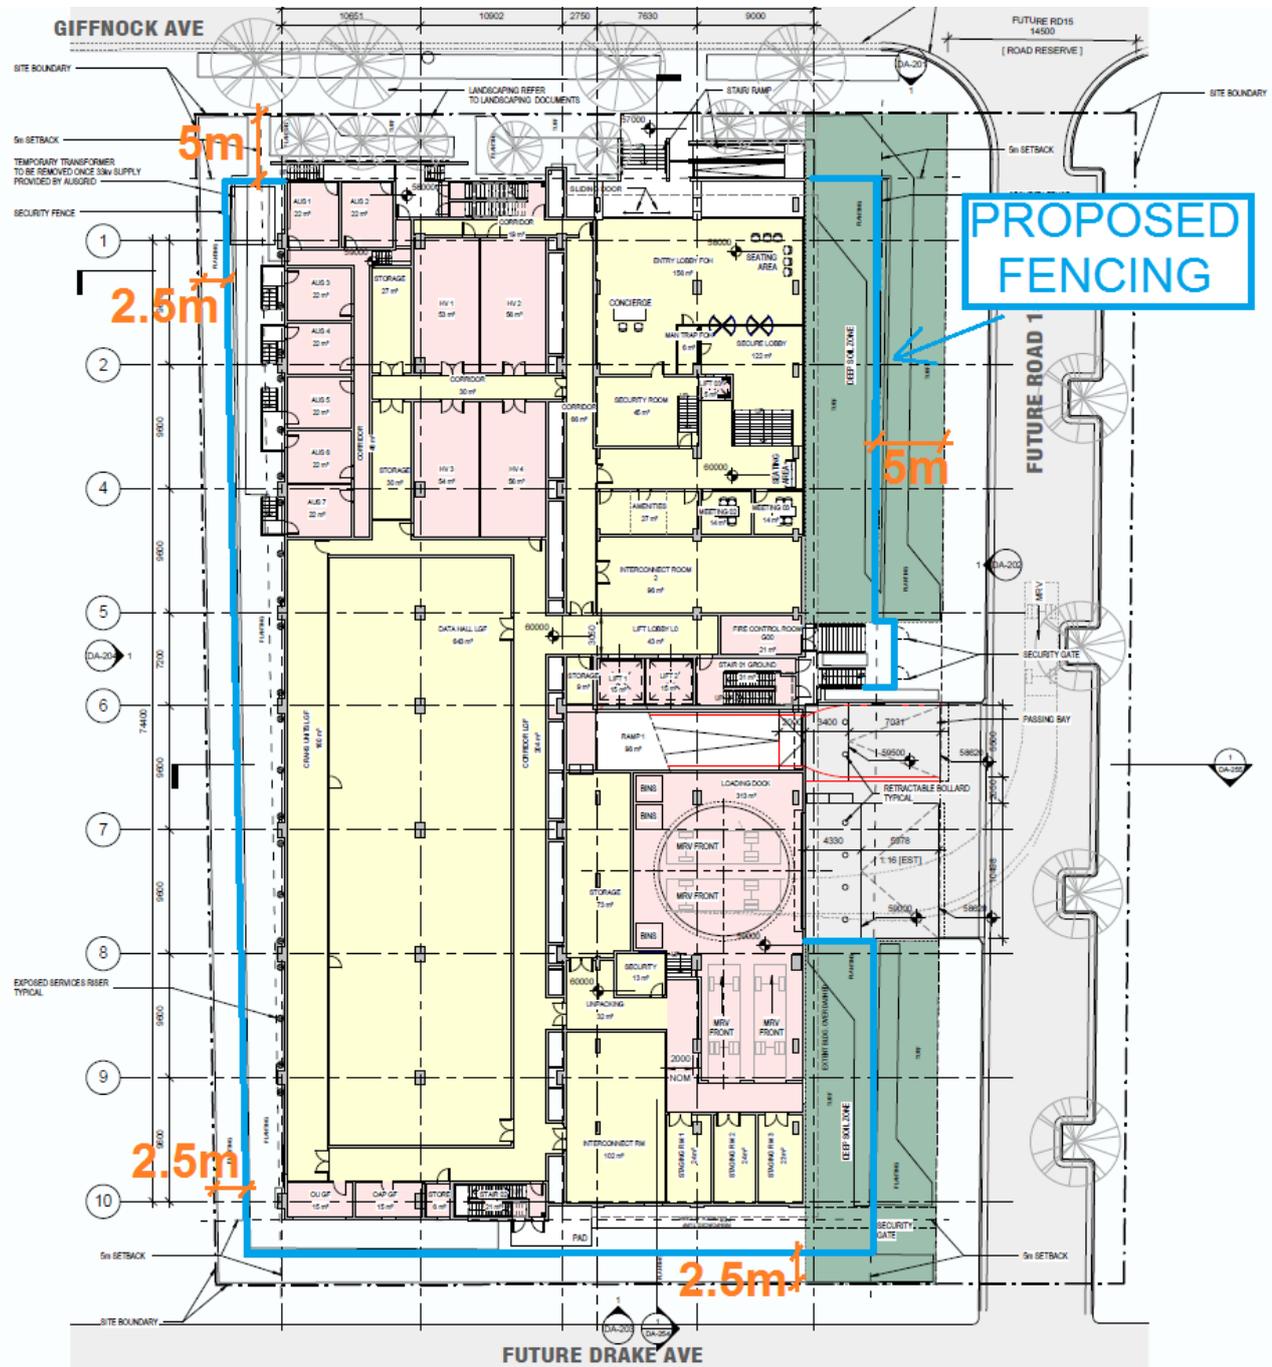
Ground Floor Plan identifying 2.1m fencing around perimeter of building
